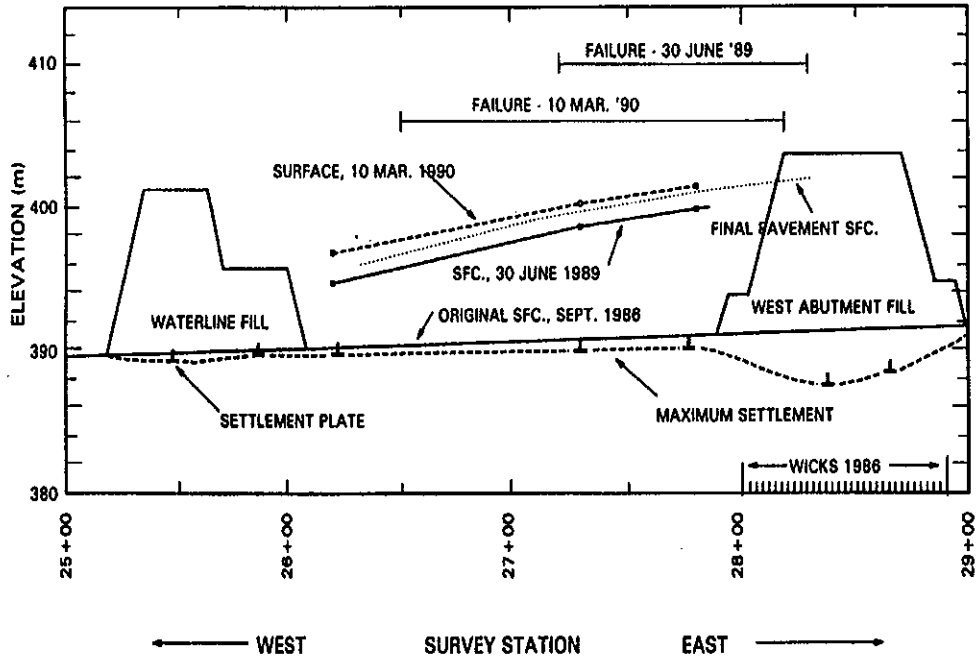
Longitudinal section through the embankment (after Crawford et al. 1995)
